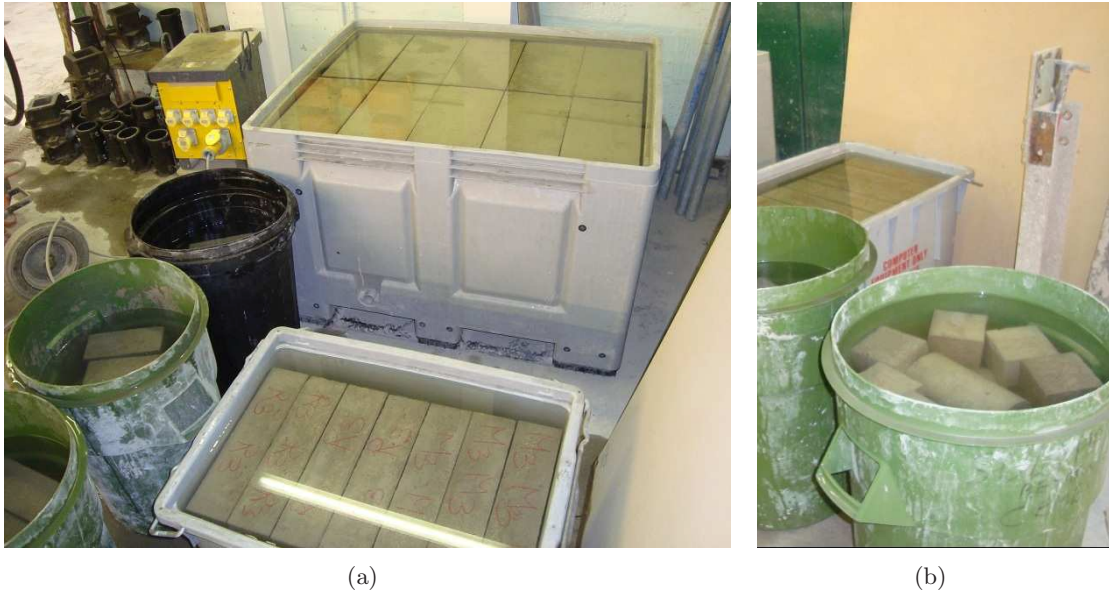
Curing process for (a) concrete blocks; (b) cubic and cylindrical concrete samples
